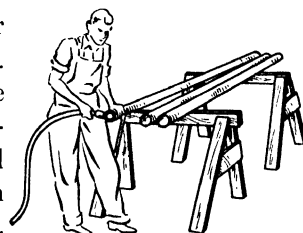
Clean piping and valves with compressed air before erection. (Courtesy of Crane Co.)
